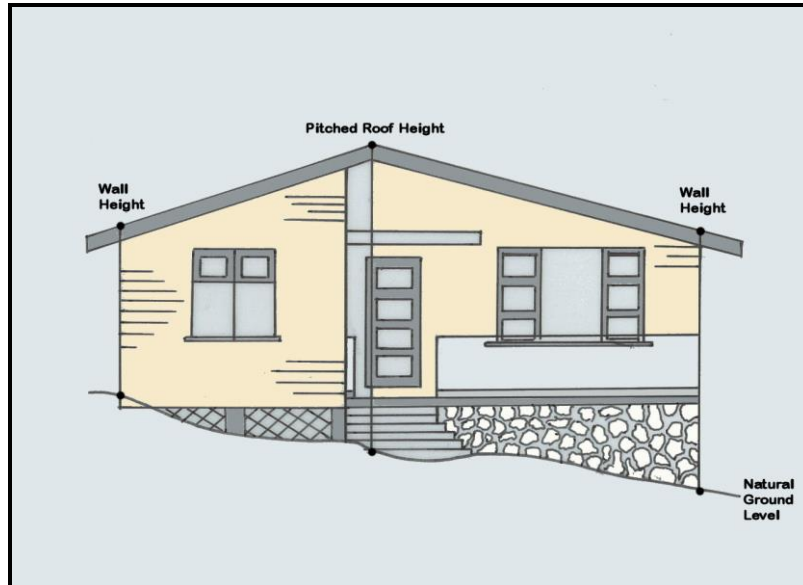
The Measurement of Wall and Roof Heights for Pitched Roof Development.
